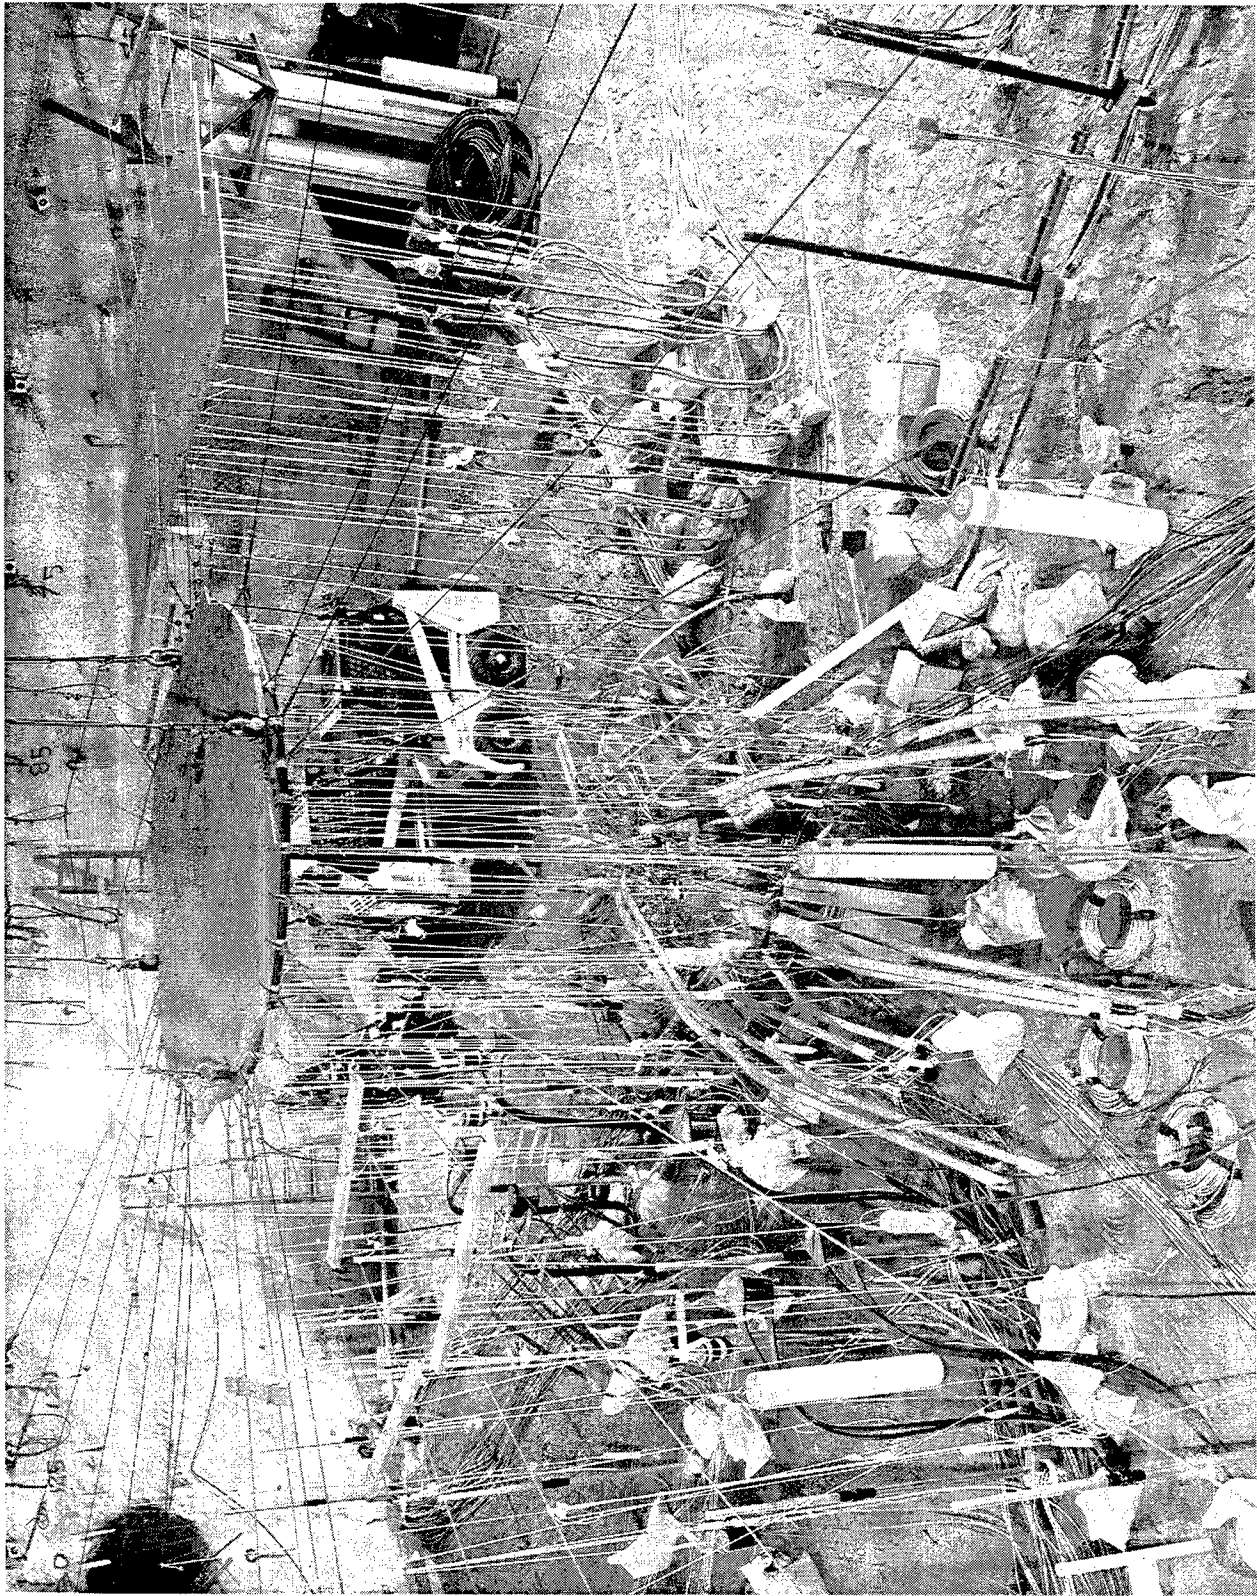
MILL YARD test - support equipment installation (Continued).
